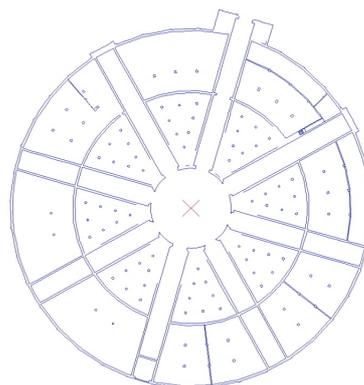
Plan of the ground floor at an elevation of 4,80 m.
